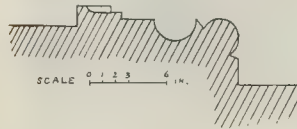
Penmon Priory, Anglesea: Section of Arch-mouldings to south door of Nave.
